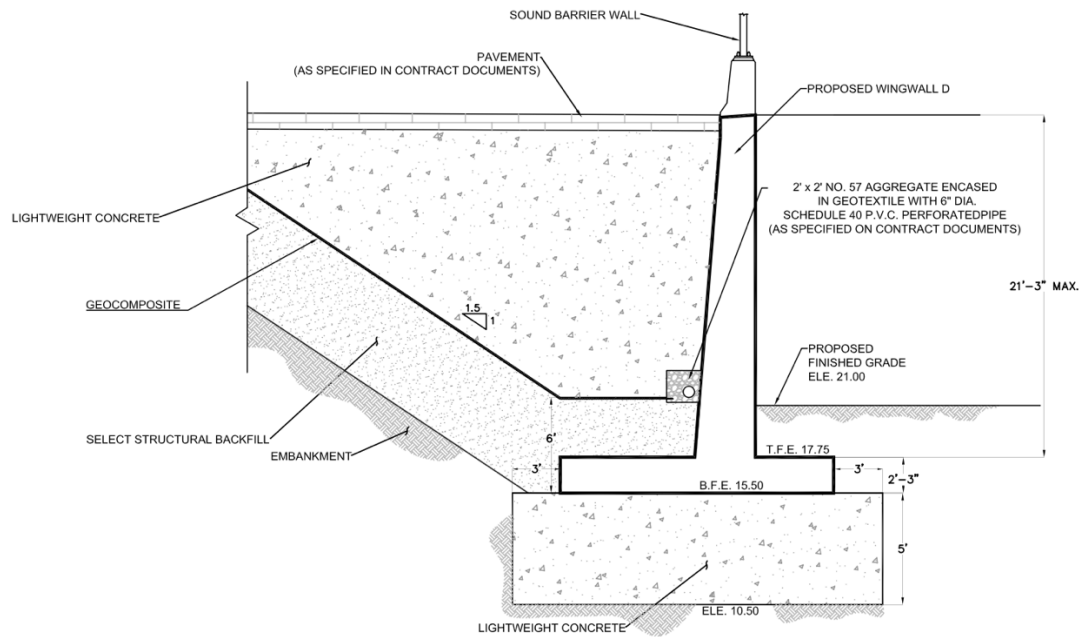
Typical cross section for Wingwall D (0095 Over Shackamaxon Street, S-26064).
